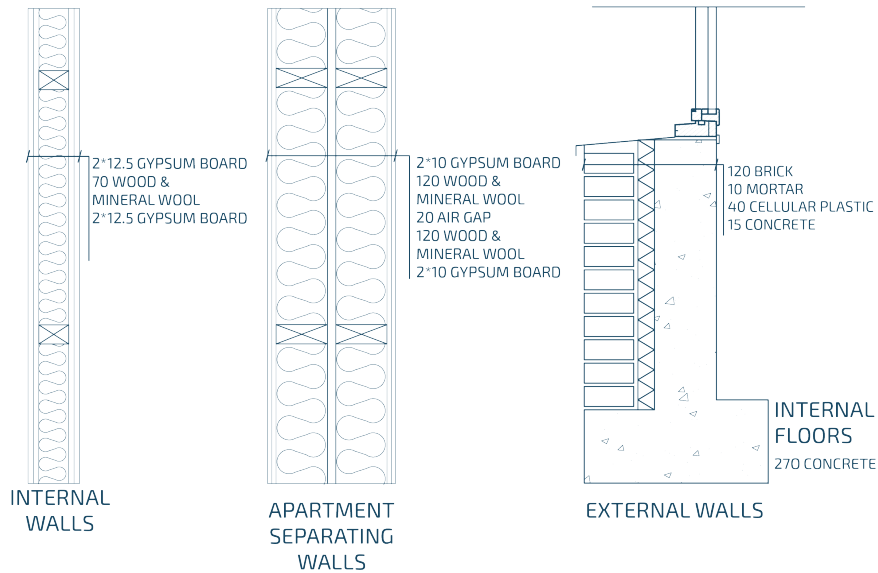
Wall and slab constructions used for stage 1 and 2, adapted from Eriksson (2024)
